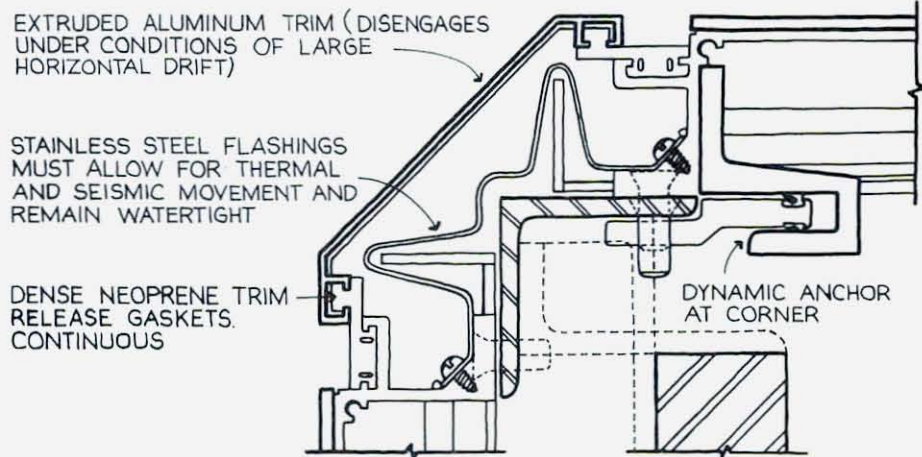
HORIZONTAL SECTION OF TYPICAL 45° CORNER PANELS.
